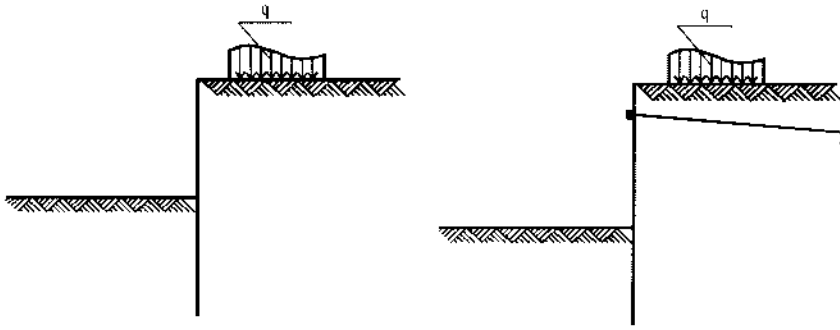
Flexible retaining walls. Left cantilever, right single anchored
